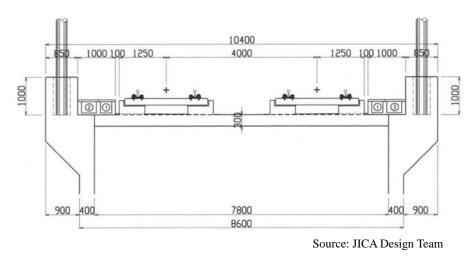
Elastic Sleeper Directly Fastened Track at Embankment Section
